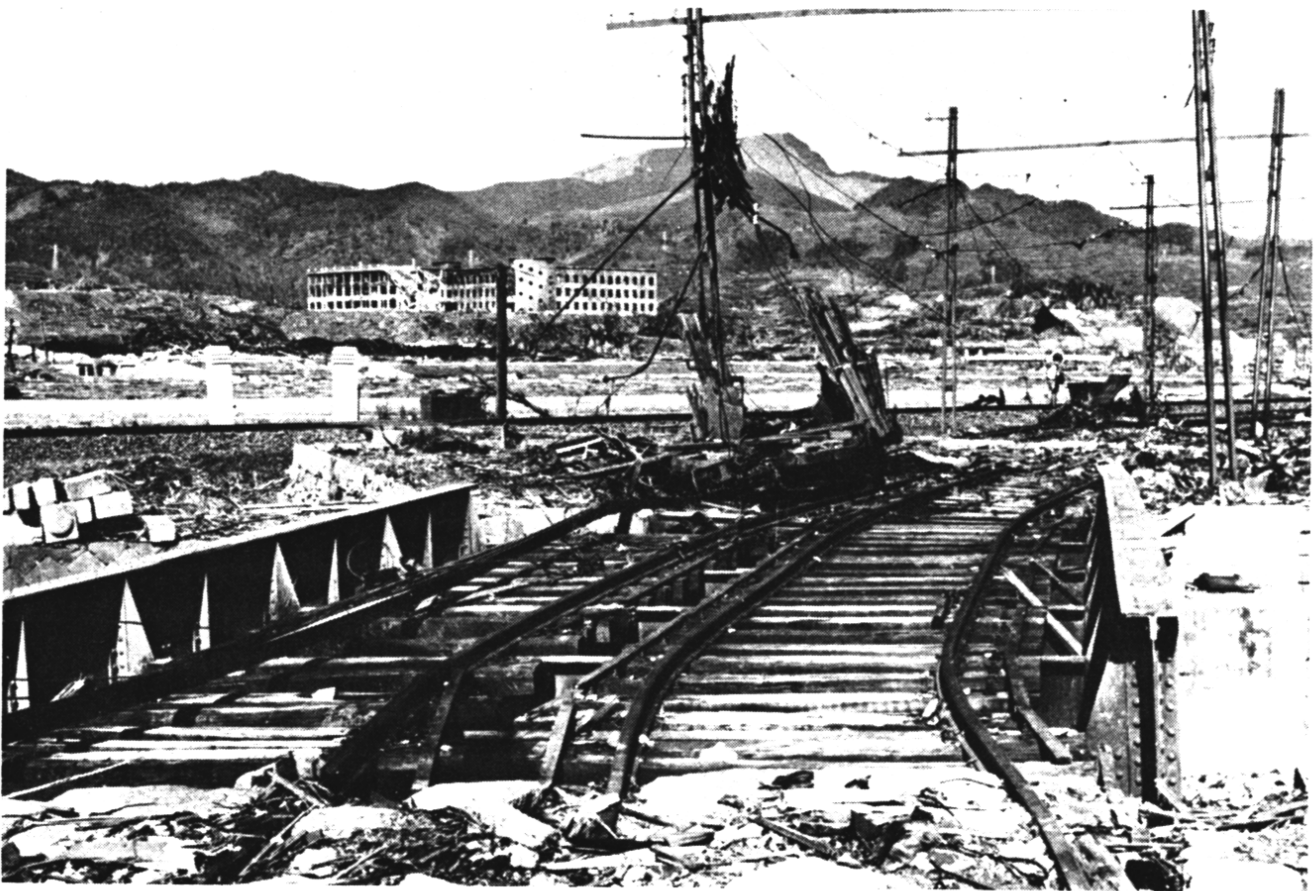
A steel-plate girder, double-track railway bridge (0.16 mile from ground zero at Nagasaki). The plate girders were moved about 3 feet by the blast; the railroad tracks were bent out of shape and trolley cars were demolished, but the poles were left standing.
